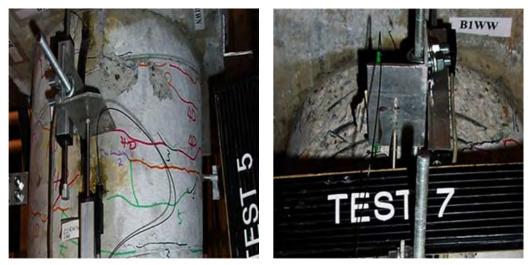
Apparent damage states for bent 1 West column bottom plastic hinge
